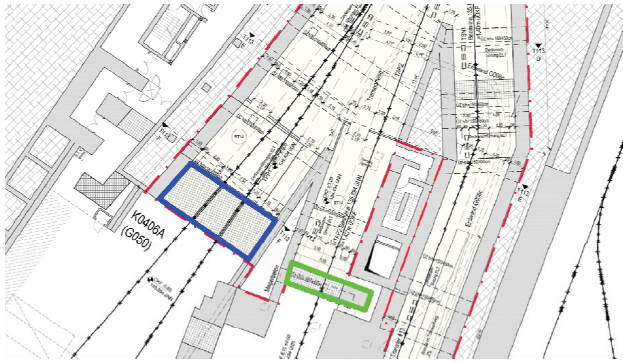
Architect plan of tunnel T113. Blue line – planned shielding wall for G050, green line – for G006c.
